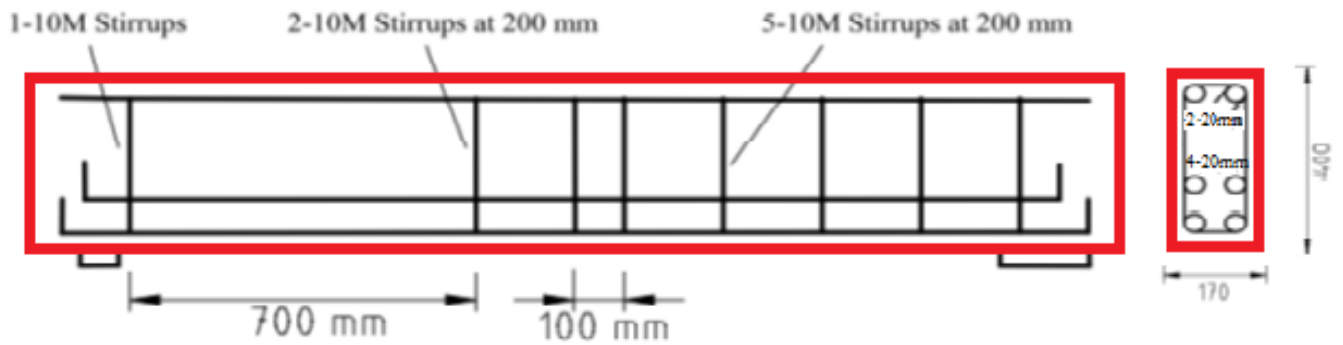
Details of concrete dimensions and reinforcement details in the beam
